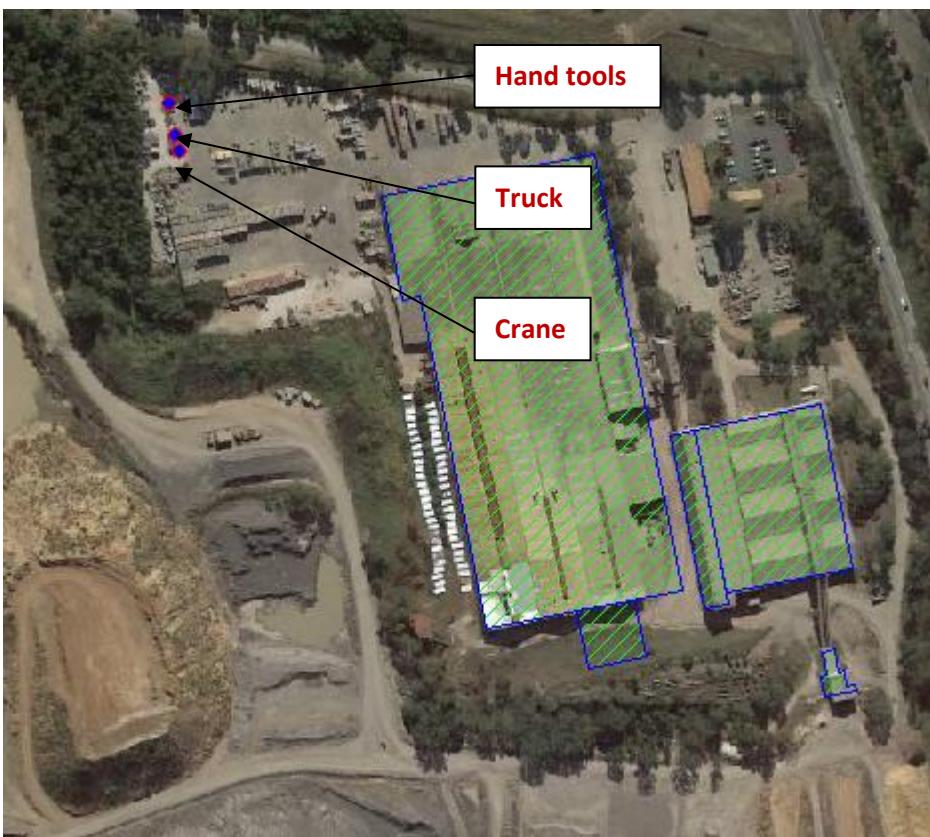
Construction Scenario 4 – Structure Construction Works
